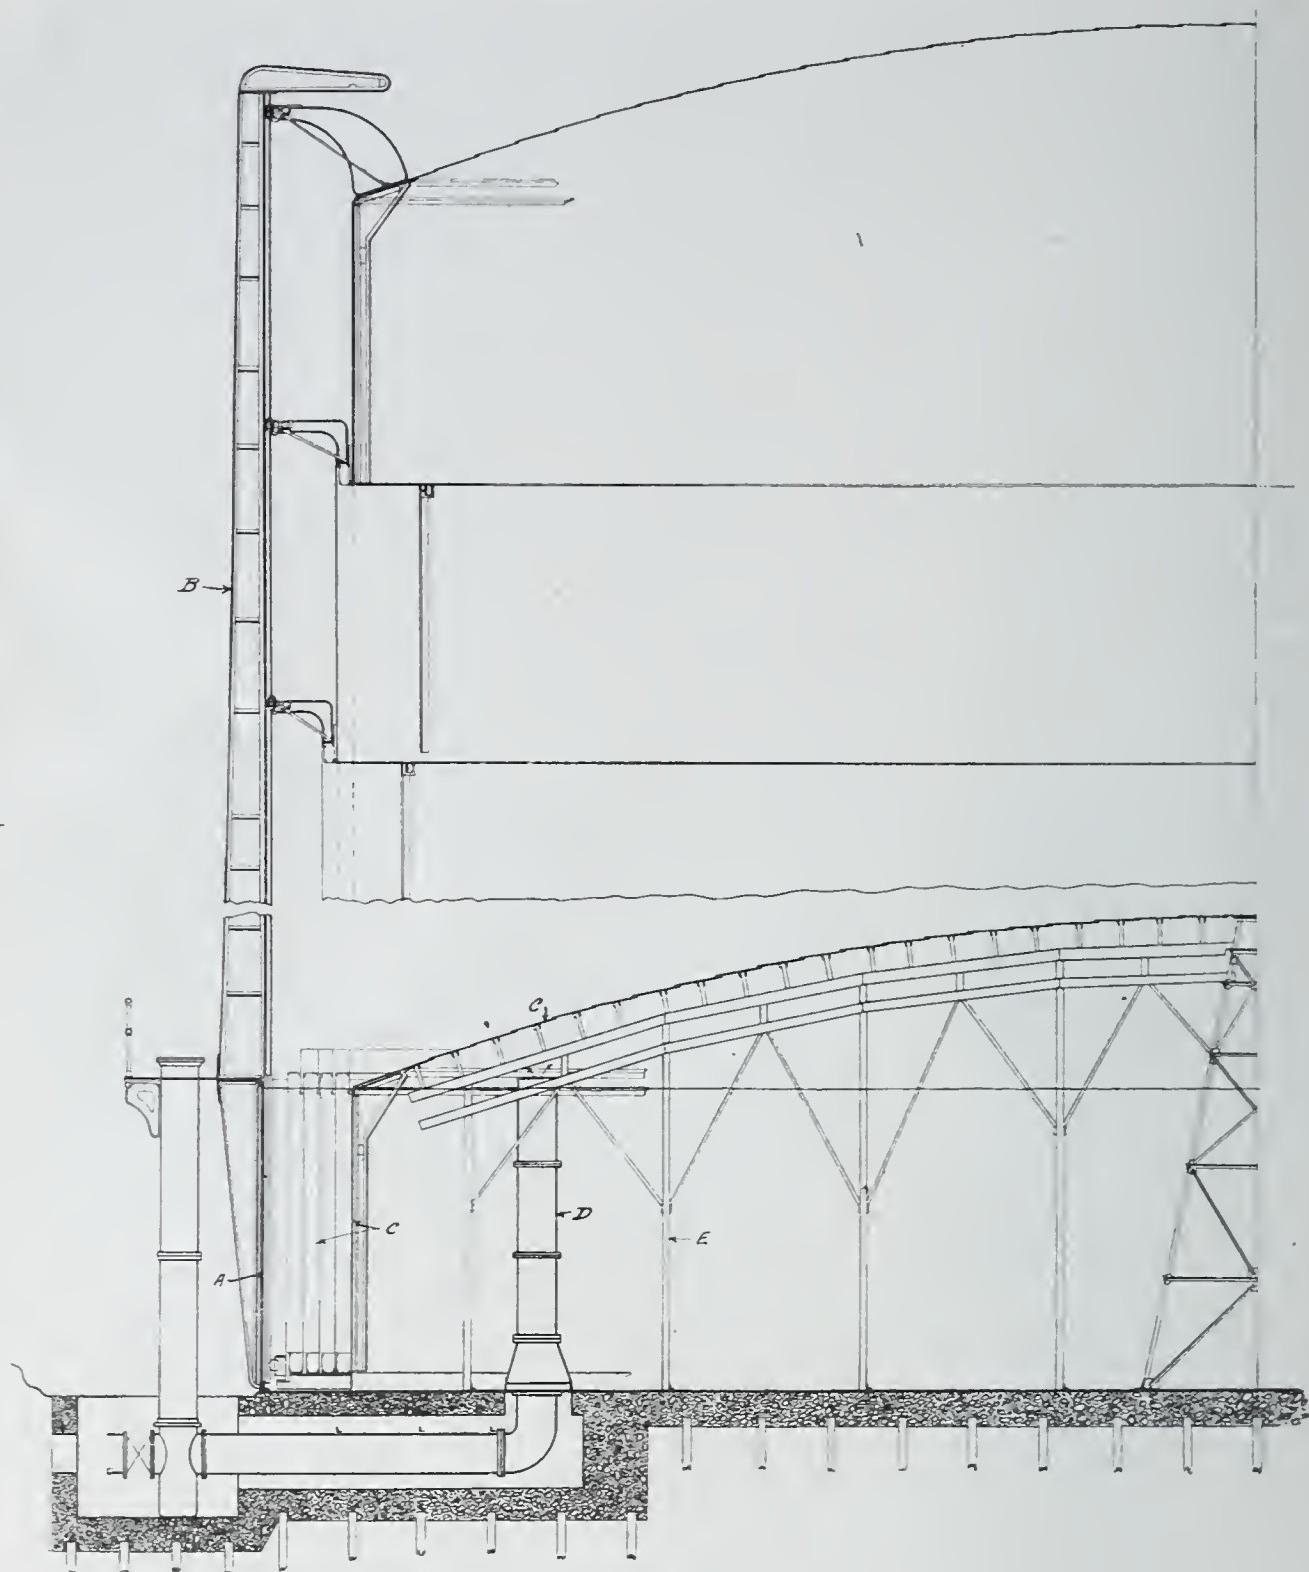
Diagram showing half cross sectional elevation of a Gas Holder.
